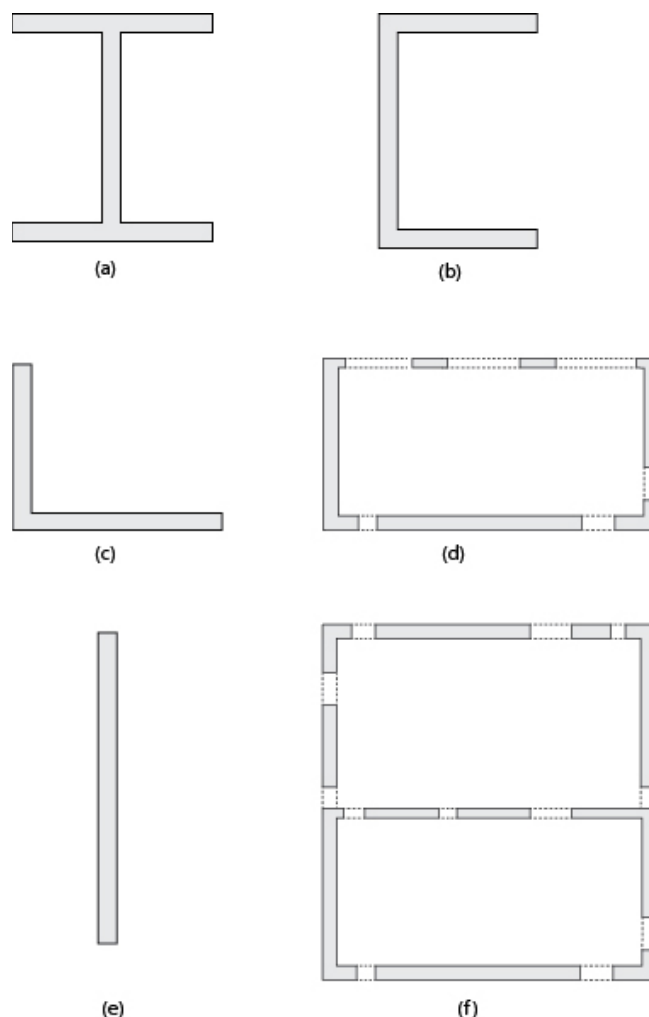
Schematics of potential shear wall configurations: (a) barbell; (b) channel; (c) L; (d) barrel; (e) blade; and (f) double barrel.
